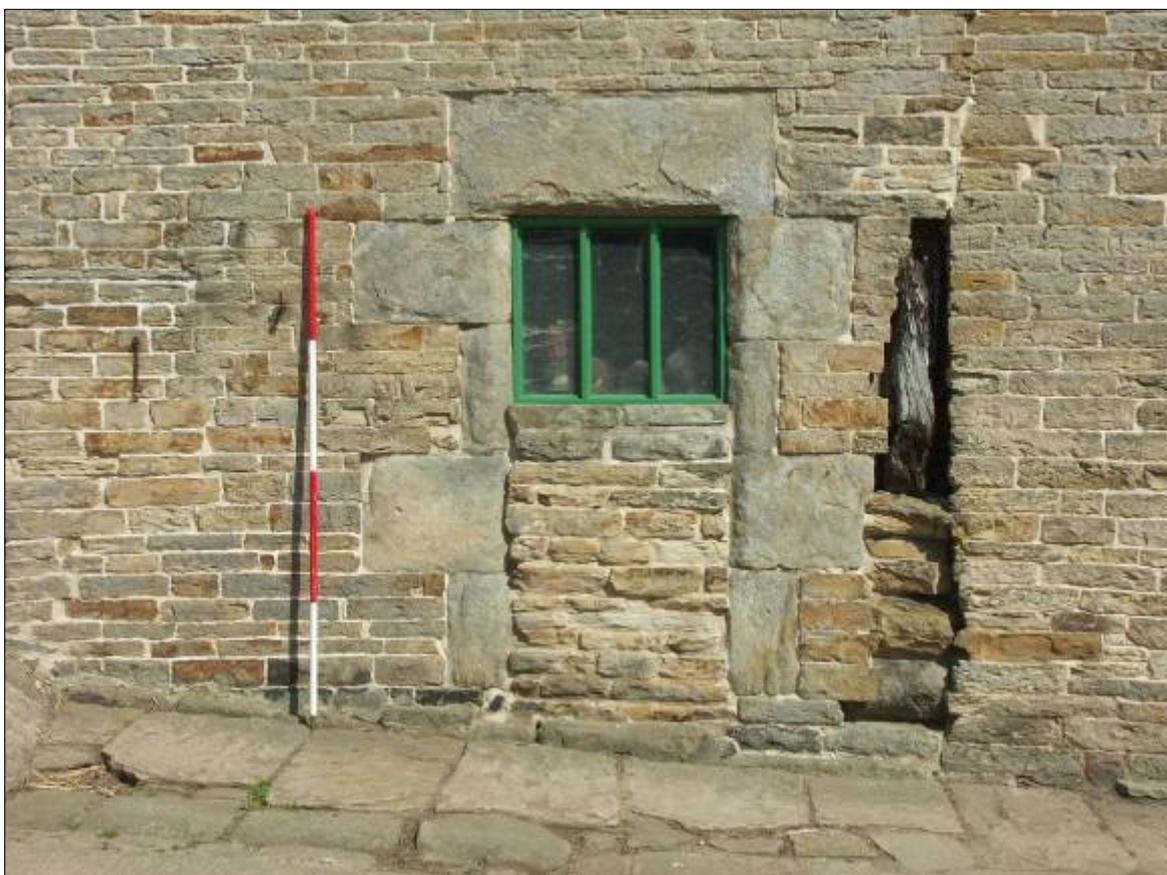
Detail of exposed cruck blade and stylobate beside a partially blocked doorway in the south wall of Building I.
